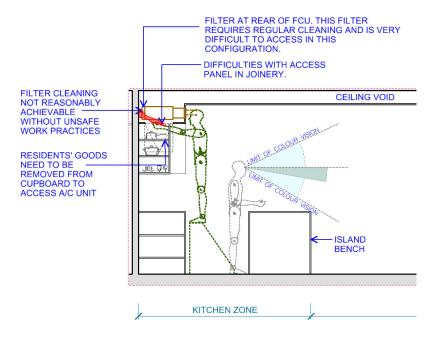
Diagram of issues associated with ceiling air conditioning units built into kitchen joinery.
